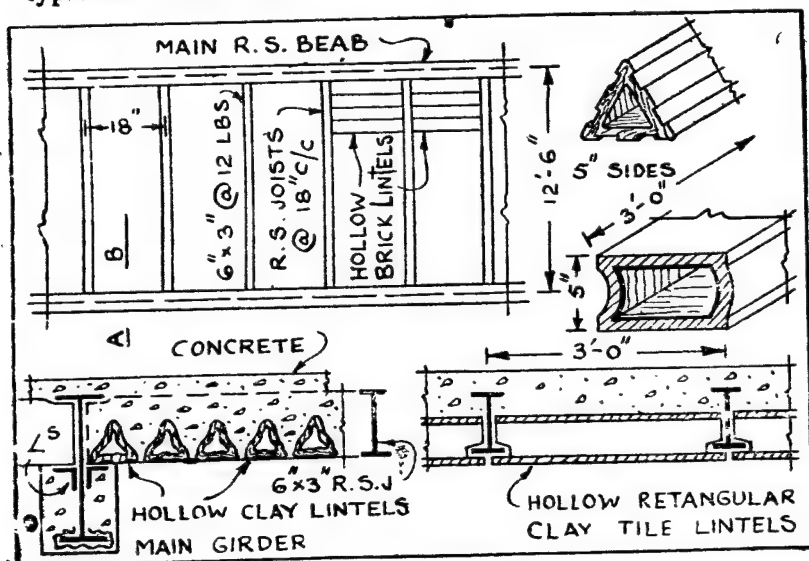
to 448. Details showing the method of constructing flat floors of triangular and rectangular hollow clay tiles.
